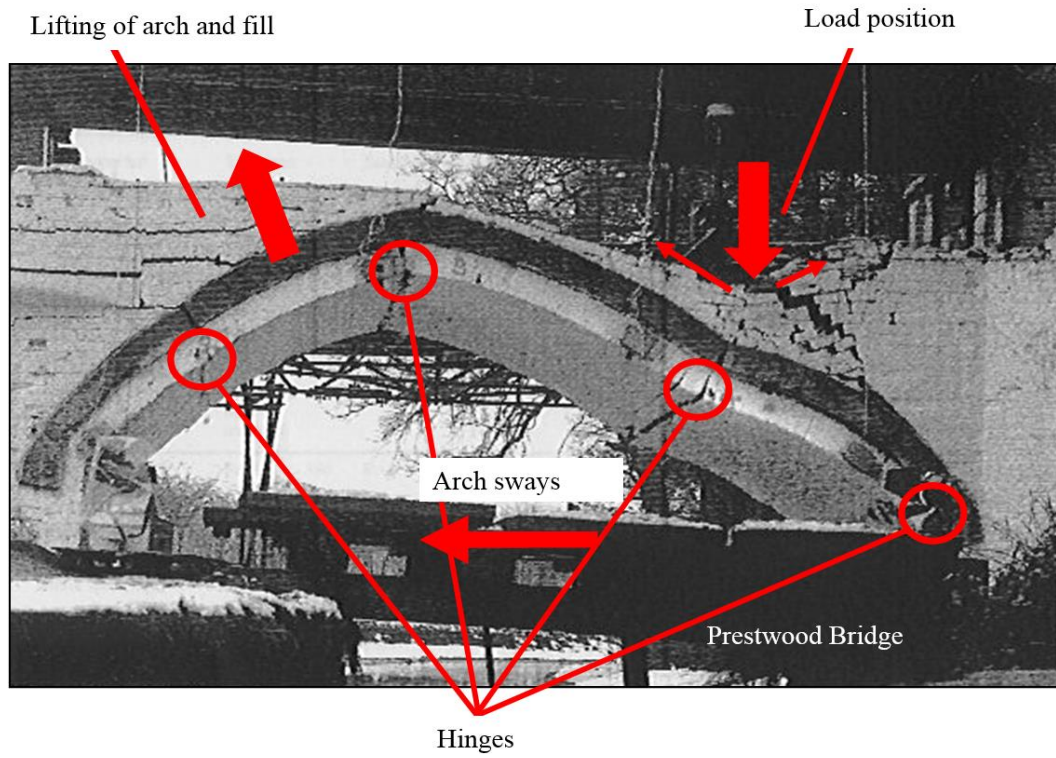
Field testing on Prestwood Bridge (Page, 1993).
